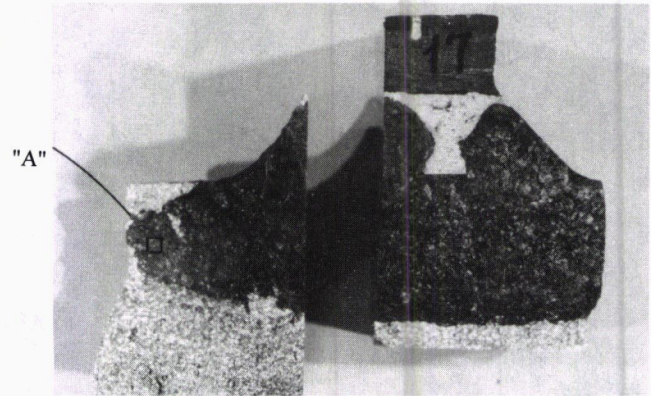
Exposed crack surface of Core 17 showing heavy oxidation.
